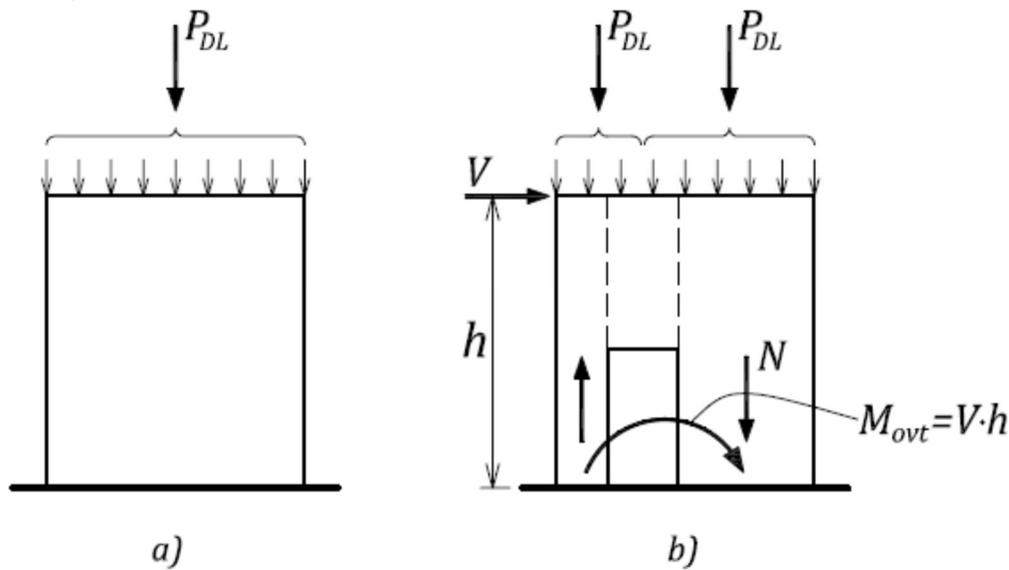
Axial load in masonry walls: a) solid; b) perforated.
